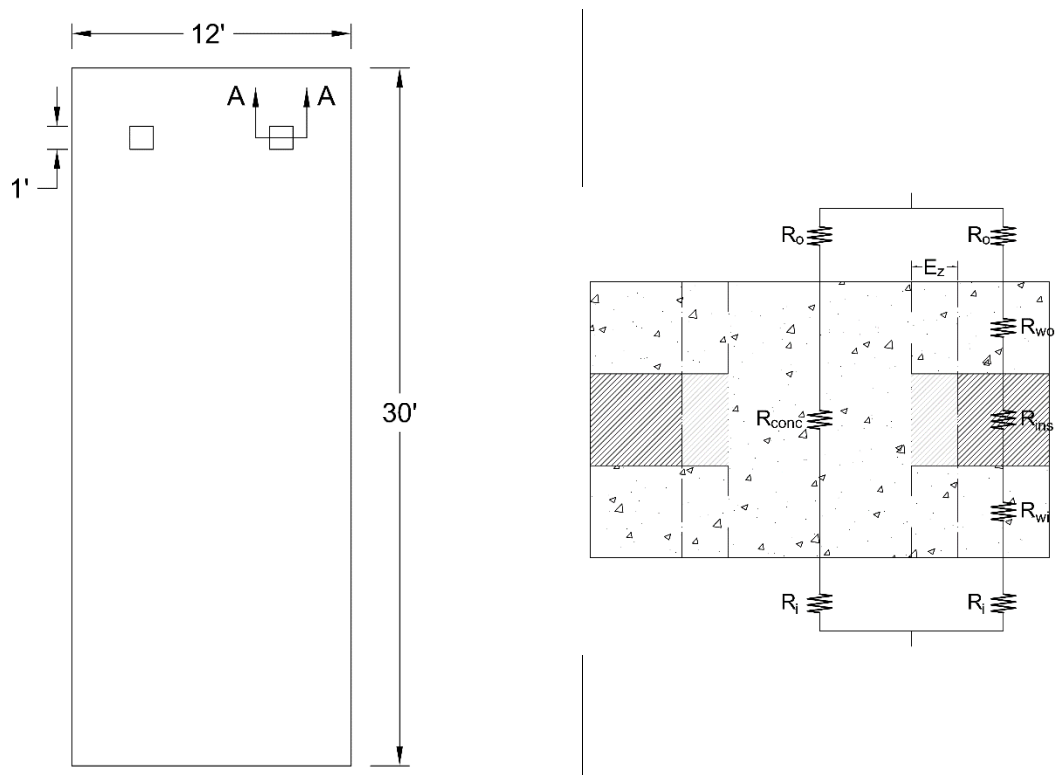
Roof example panel layout and cross-section with electrical circuit analogy
